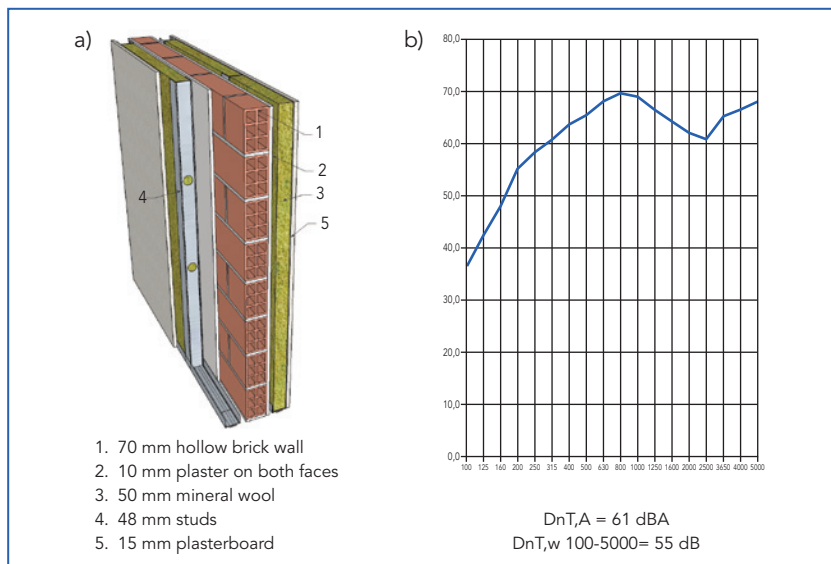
a) Example of Type 1 separating wall. Masonry between independent panels. b) Typical airborne sound insulation.
